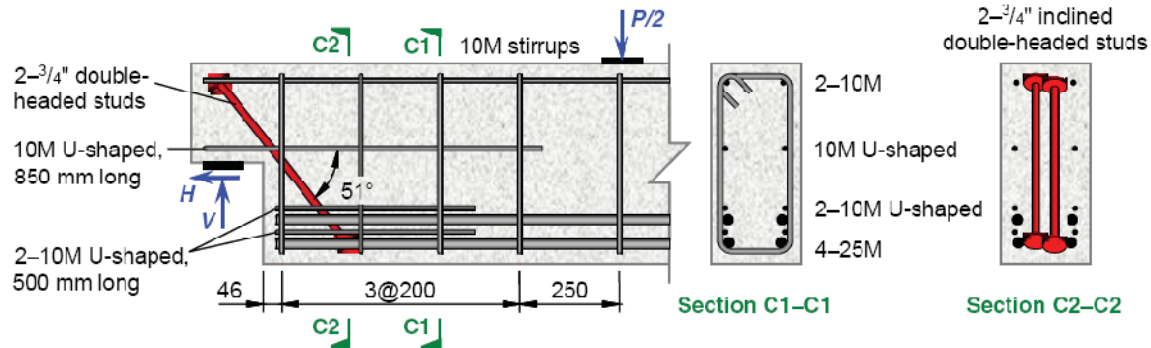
Detail of inclined headed reinforcement (Herzinger & Elbadry, 2007).
